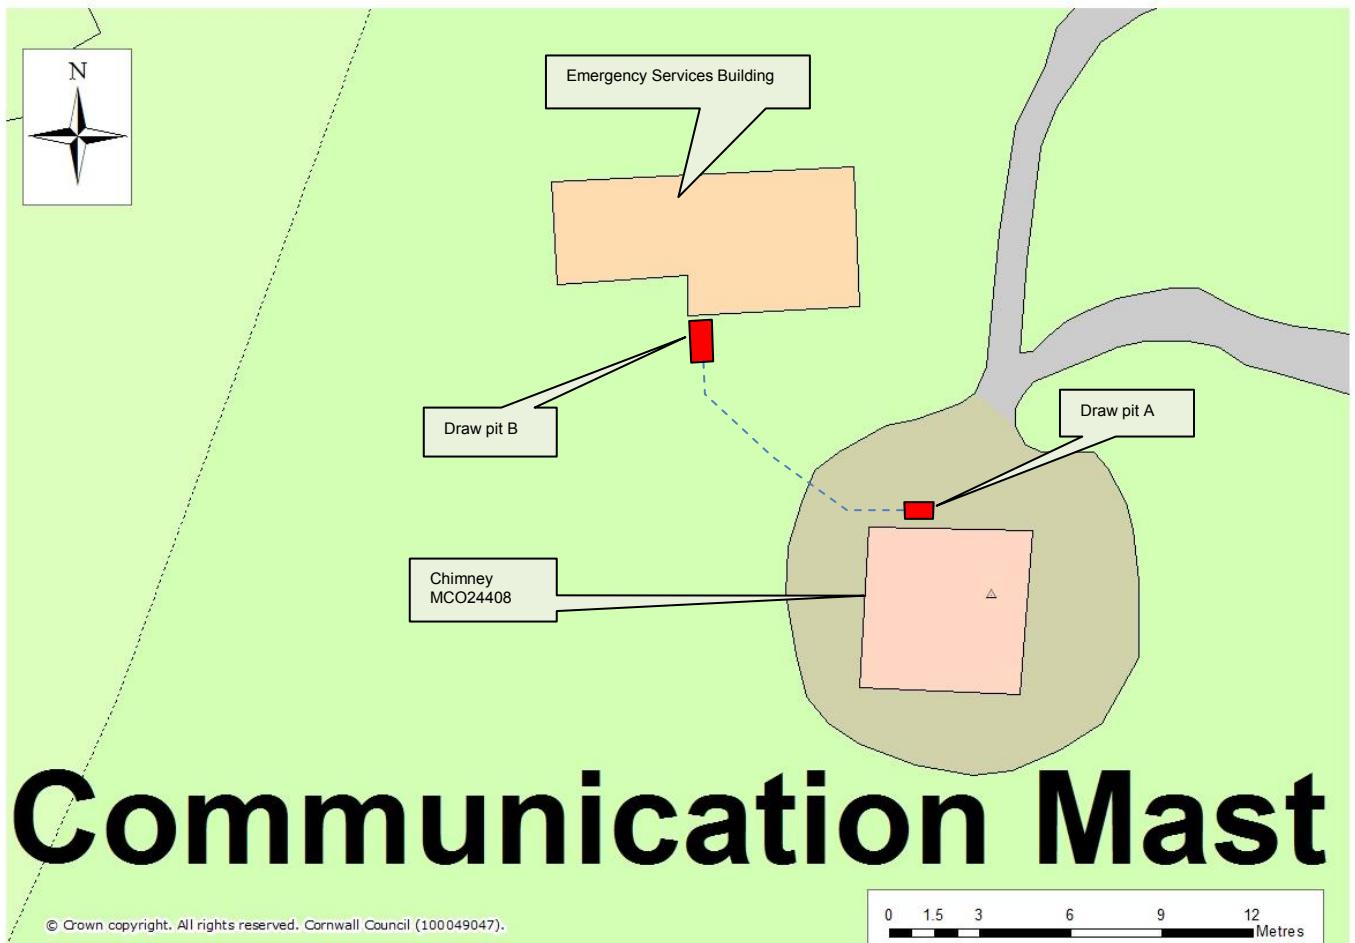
Site plan showing location of drawing pits (red), and line of ducting (blue).
